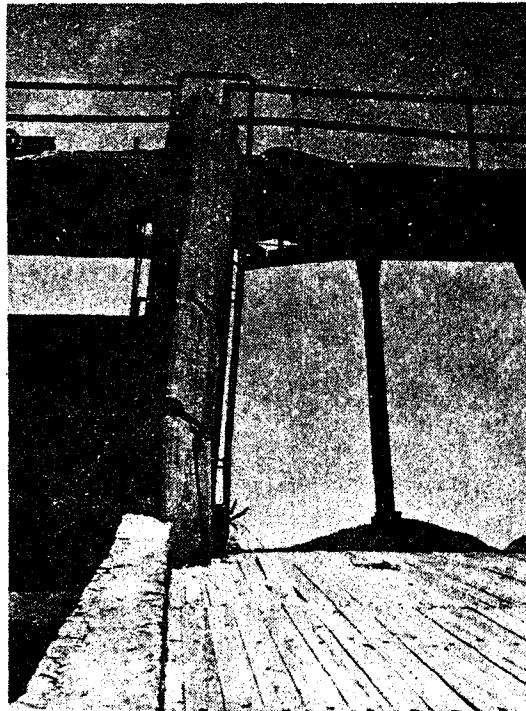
Fracture of the pier and buckling of the bridge steel girders.
